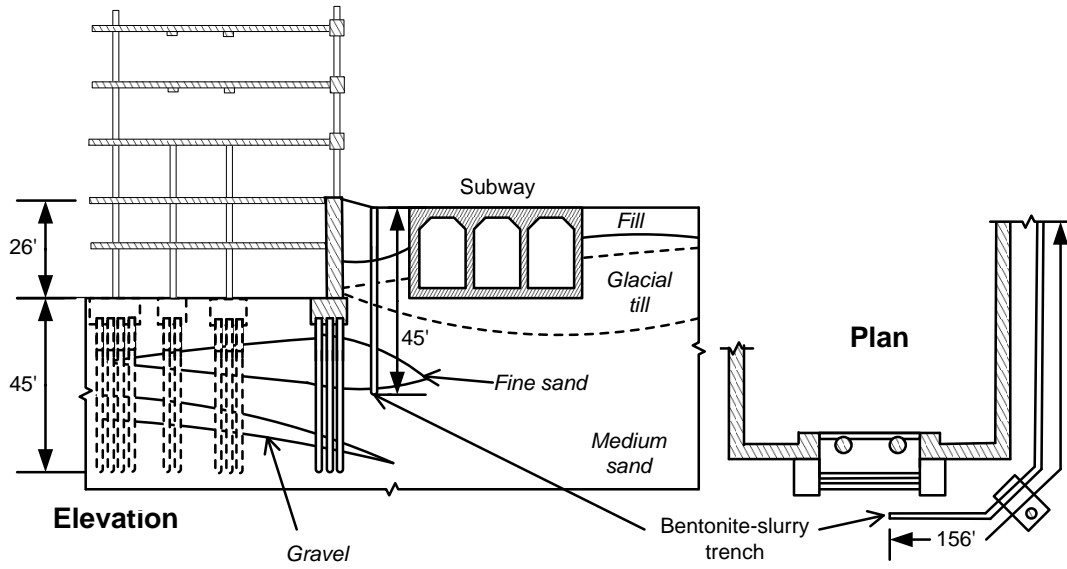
9: Building isolation using bentonite-slurry-filled trench (after Neumeuer, 1963).
